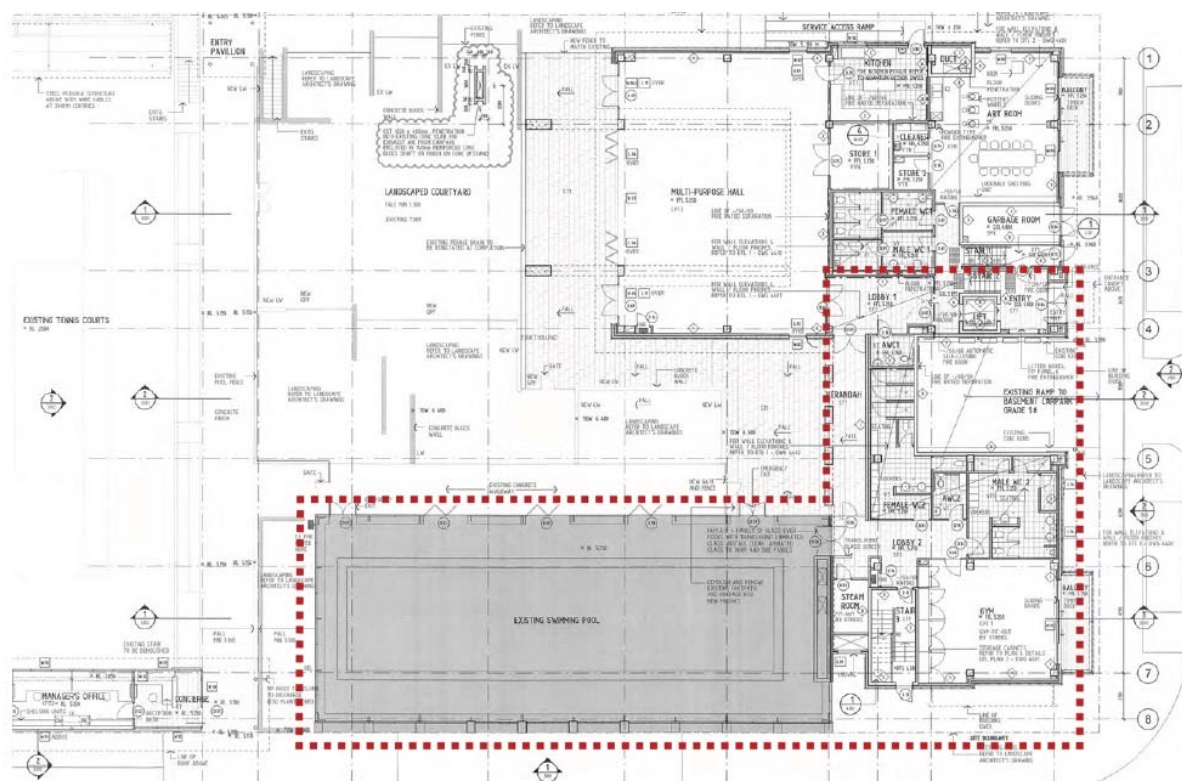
| Extract of the architectural plans illustrating the location of the indoor gym and pool (Source: the Applicant's SEE)
